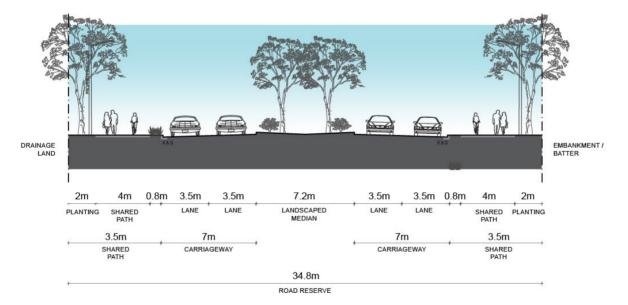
Sub-arterial road cross-section (Burdekin Road)
